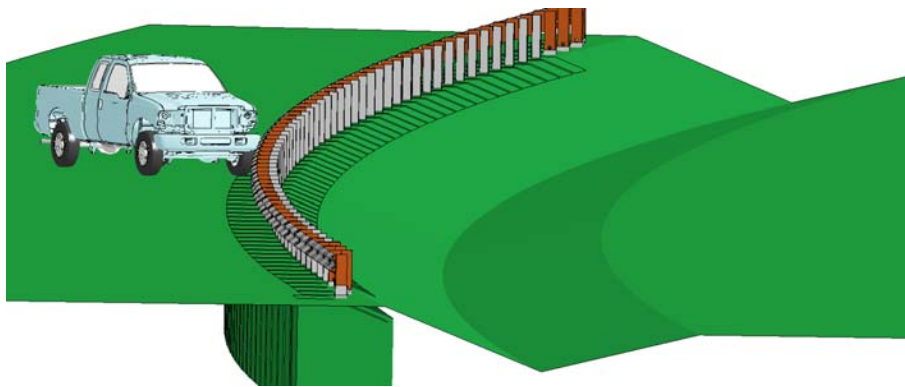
FE model of a front-side impact on a single-faced W-beam guardrail with convex horizontal curvature placed on a 2.5H:1V slope and impacted by a Ford F250.
